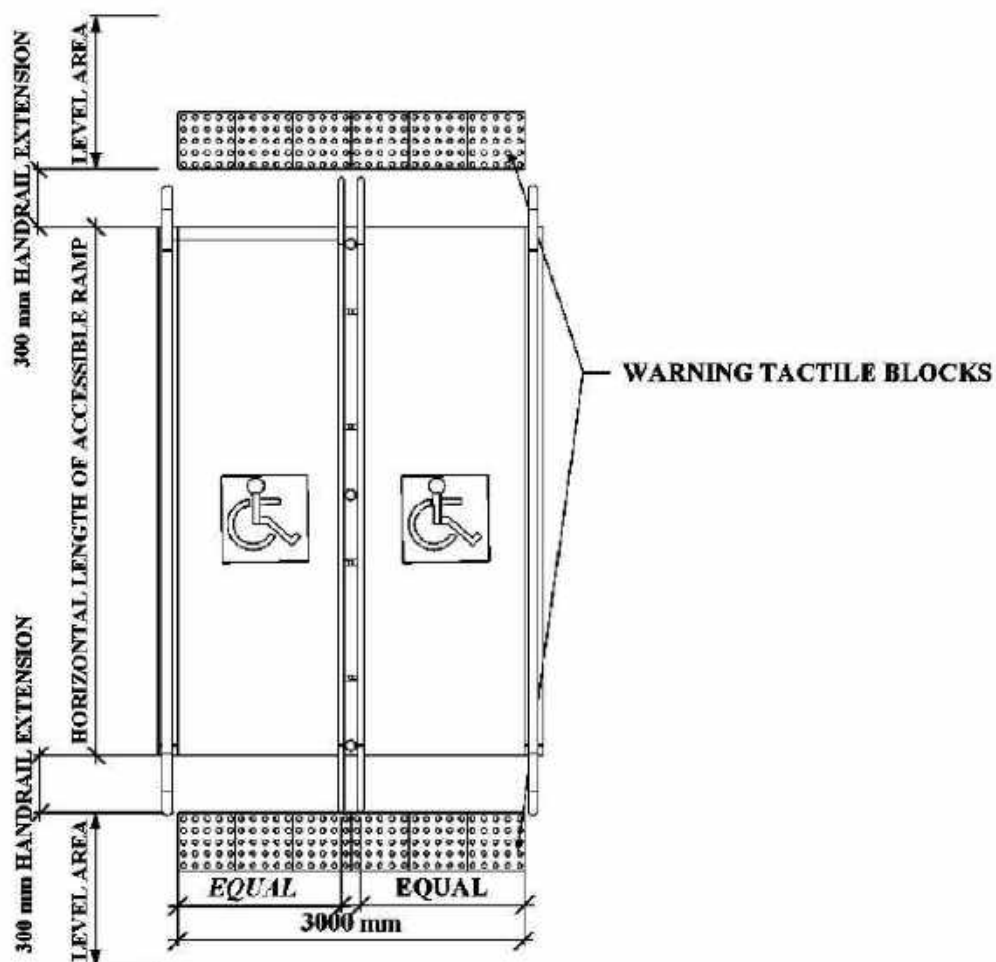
Image above shows a plan view of an accessible ramp more than 3.00 M wide and complete with handrails (including intermediate handrails) and continuous curbs on both sides and the middle, signage, and Warning Tactile Blocks
